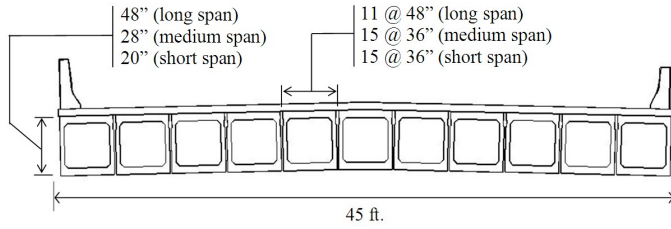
Medium Span Box Beam Bridge Cross-Section.
